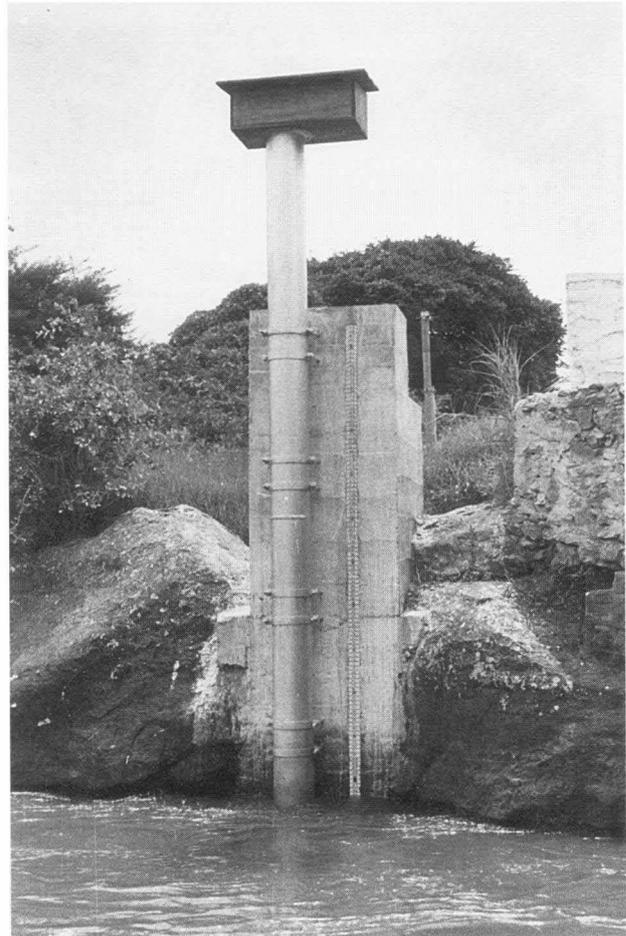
Hydrometric station. Stilling well made of steel tube and supported by concrete pier, wooden "look-in" type instrument shelter, crest-stage gauge a little to the right of concrete pier (Little Ruaha at Ihimbu, Tanzania).
